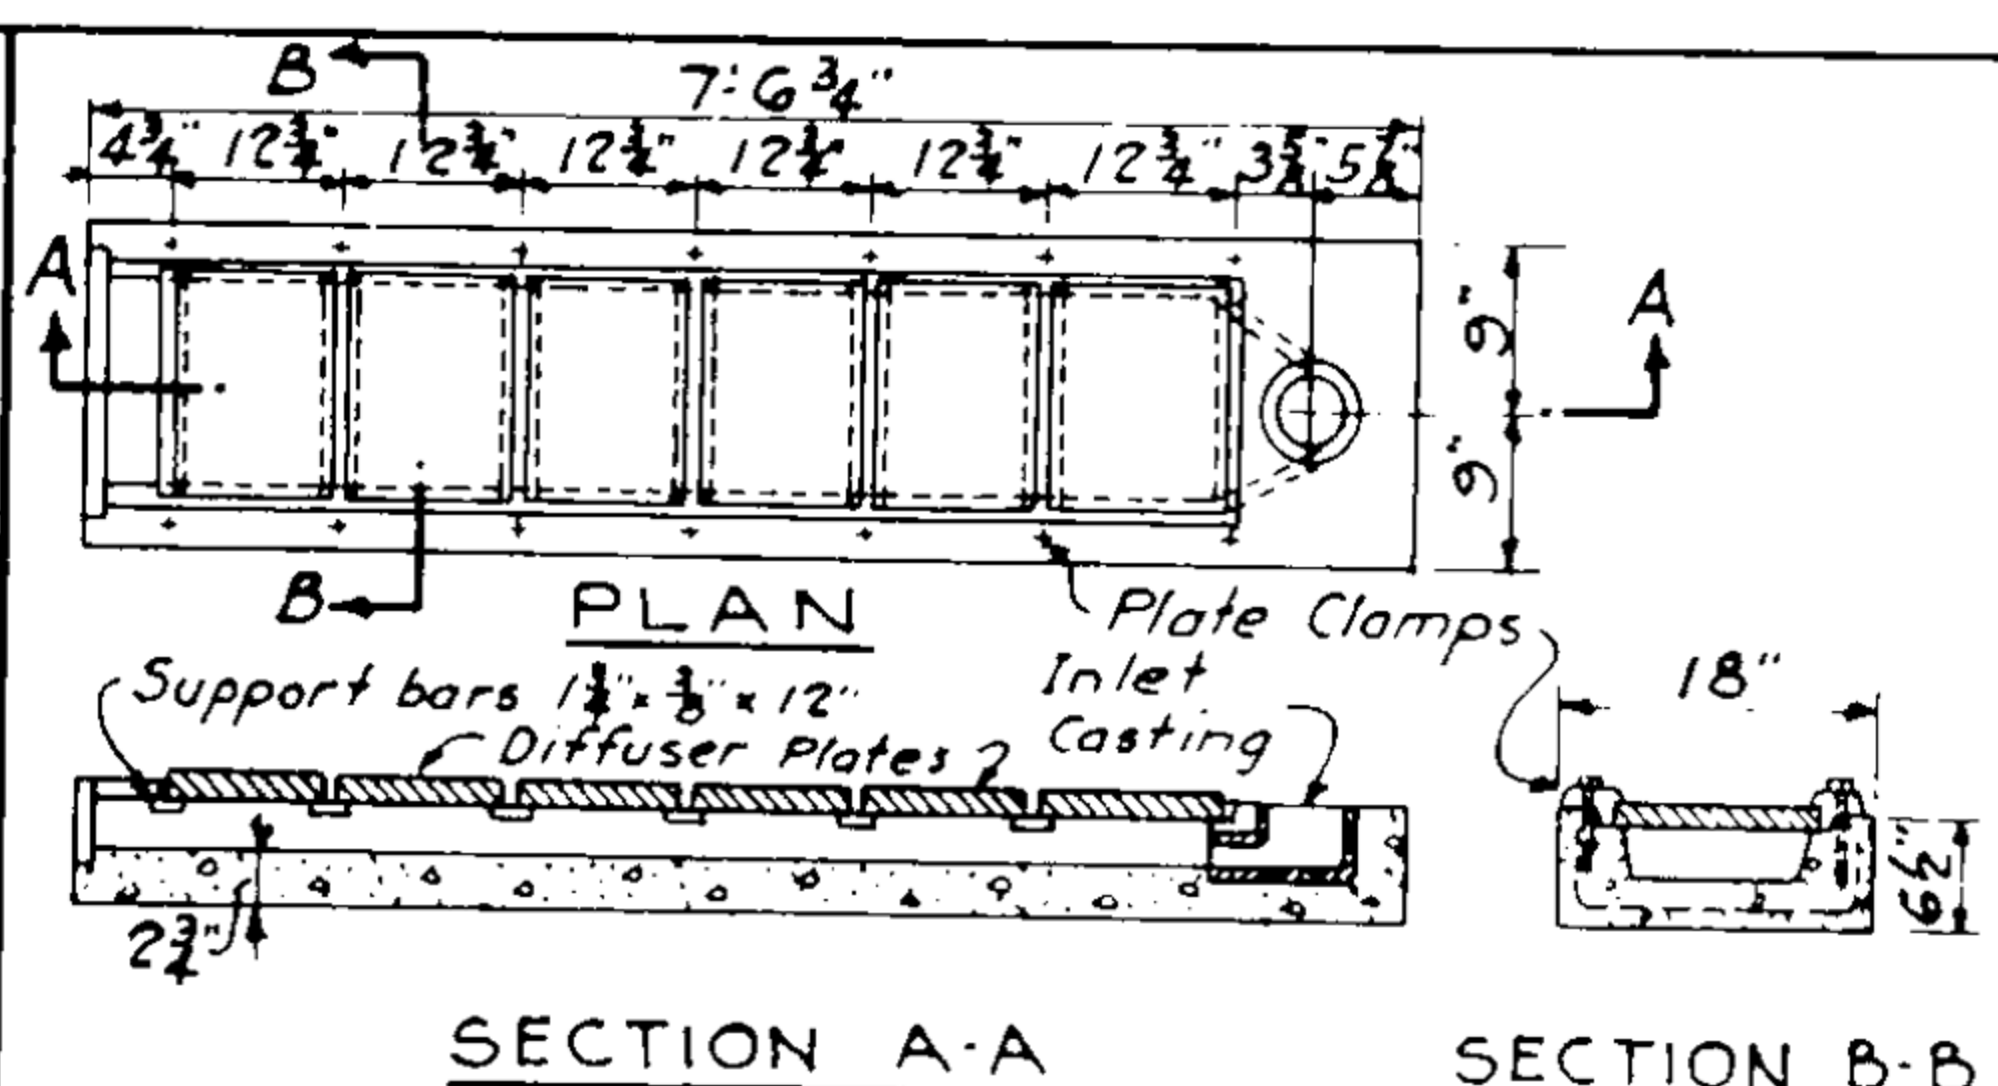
FIG. B - DETAILS OF A DIFFUSER PLATE CONTAINER.
